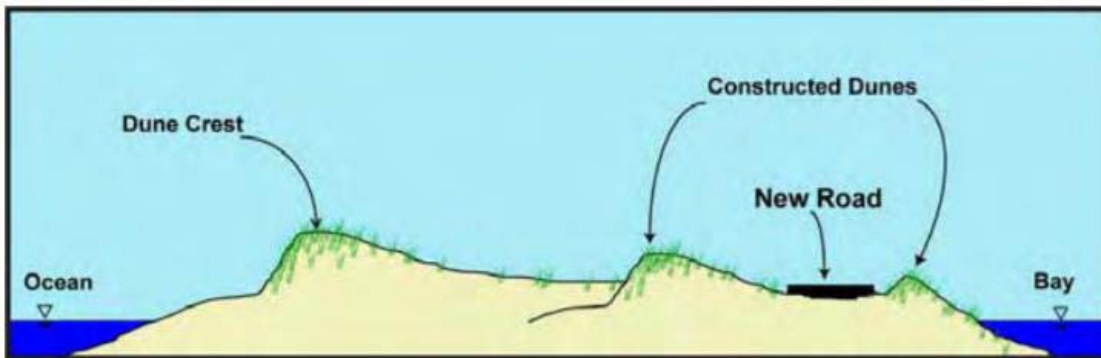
Schematic Summarizing Three Approaches (Bayside Location, Low Elevation, Dune Construction) to Minimize Damage to Roads that Overwash (FHWA, 2008)
